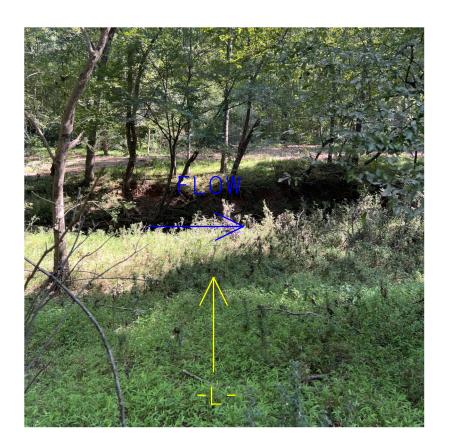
VIEW NEAR END BENT NO. 1, FACING UPSTATION
